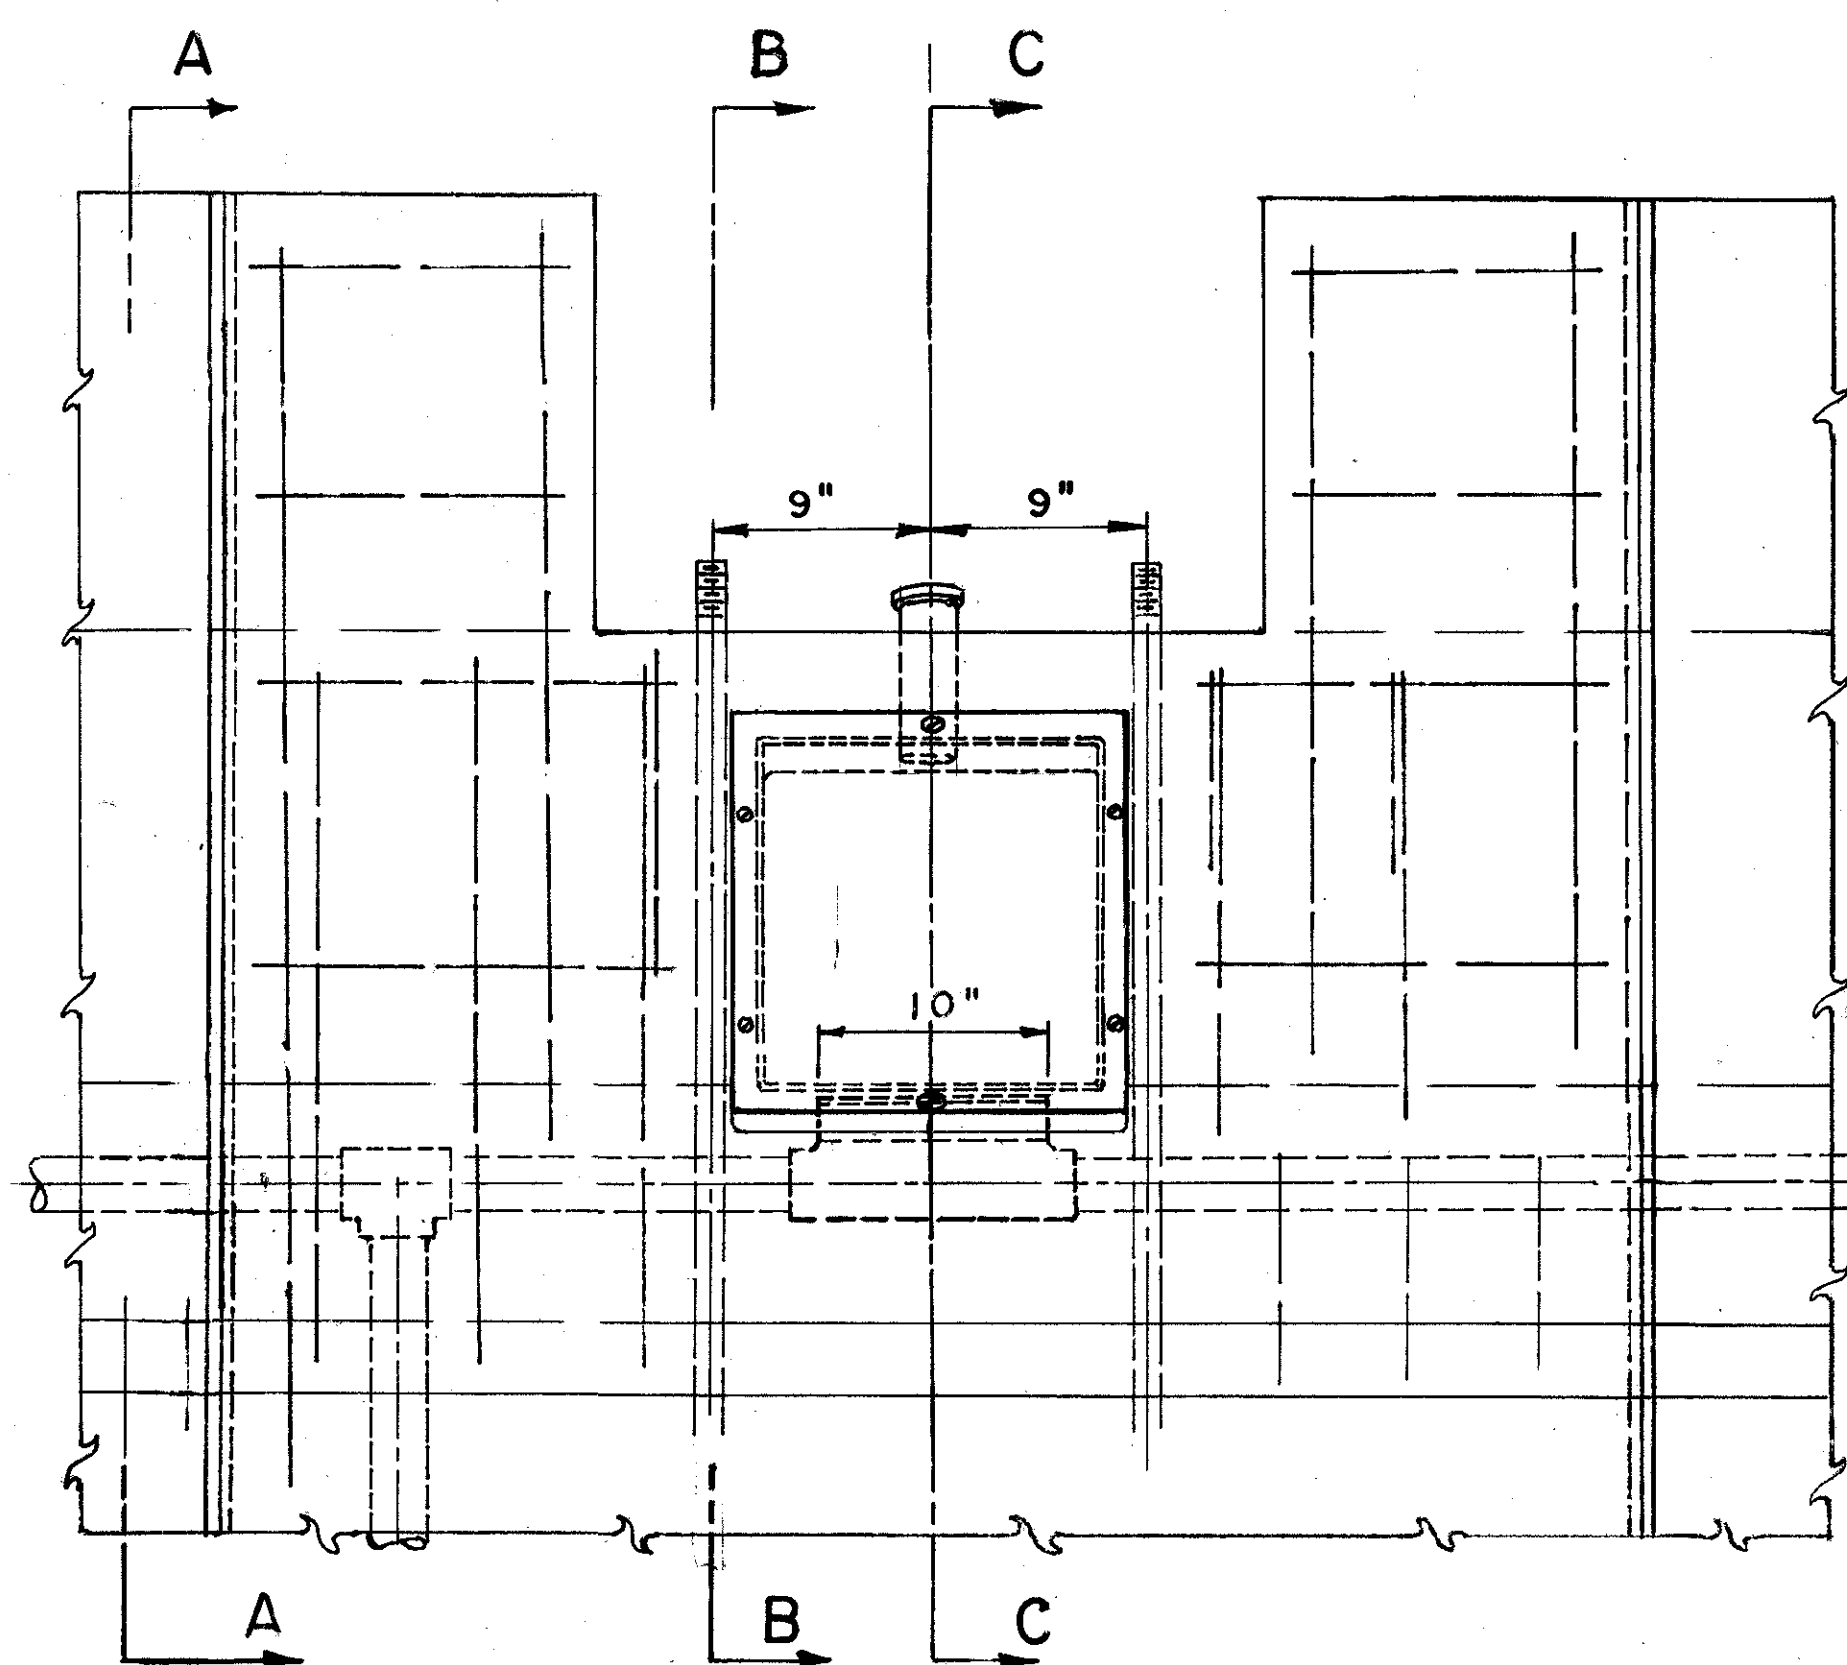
DETAIL OF TOP OF CONCRETE POUR BELOW JUNCTION BOX AT SECTION C-C
